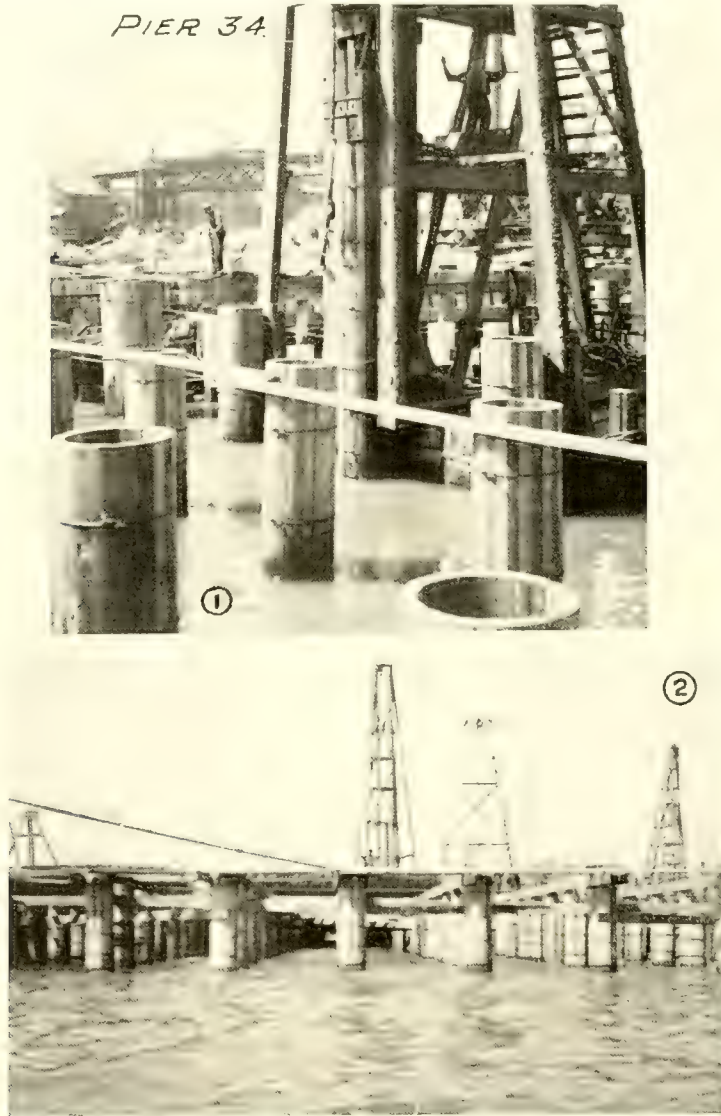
(1) Holmes wooden stave cylinders being driven at Pier 34, San Francisco.
